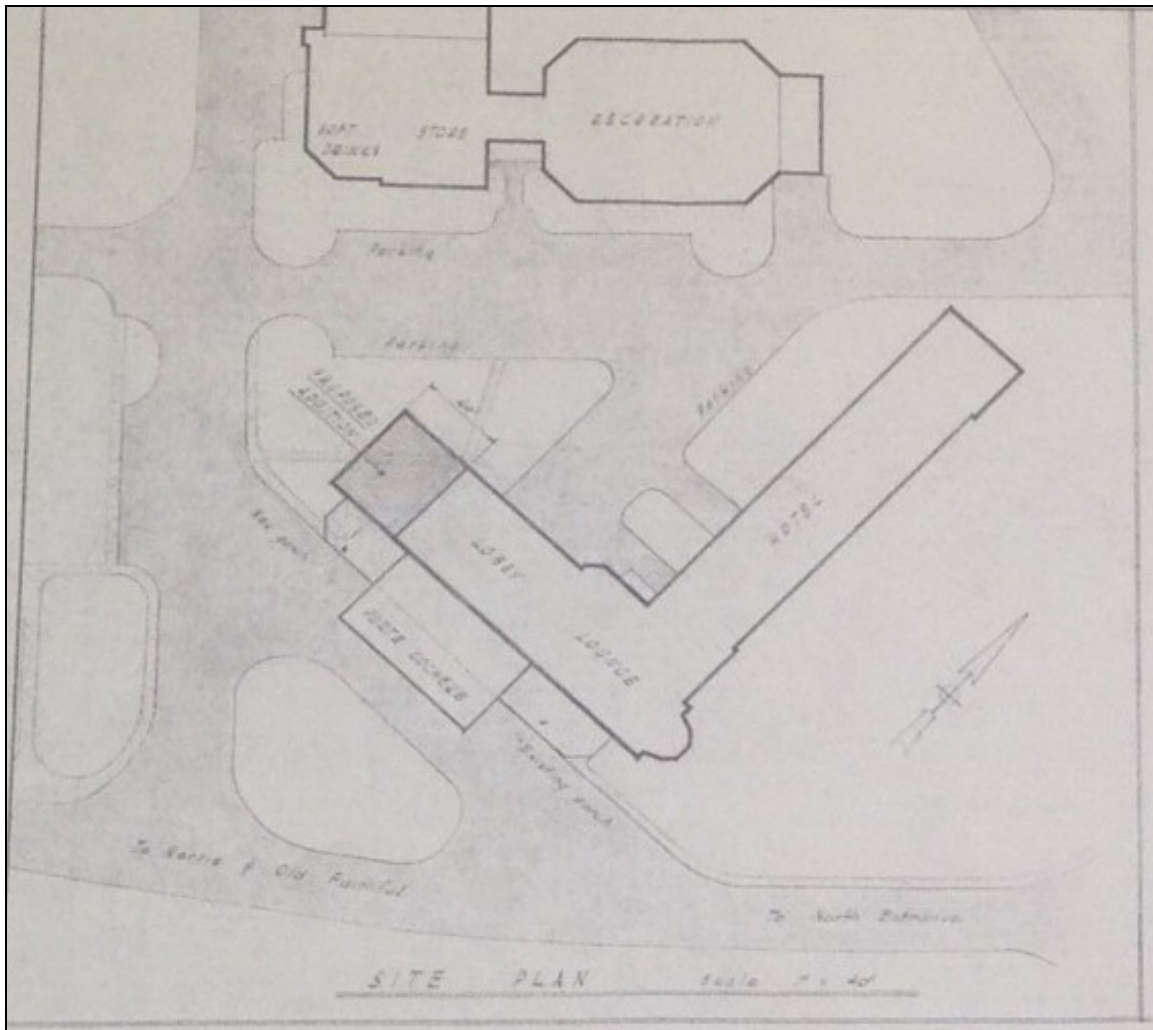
Portion of Sheet 2, Site Plan and Elevation "Proposed Additions & Alterations to Mammoth Hotel Building." File 428, Subseries A: Architectural Drawings 1903-2006 & undated, Series V: Facilities and Maintenance 1903-2007 & undated, Maps and Drawing Collection (Catalogue No. YELL 145676), NARA YELL.
